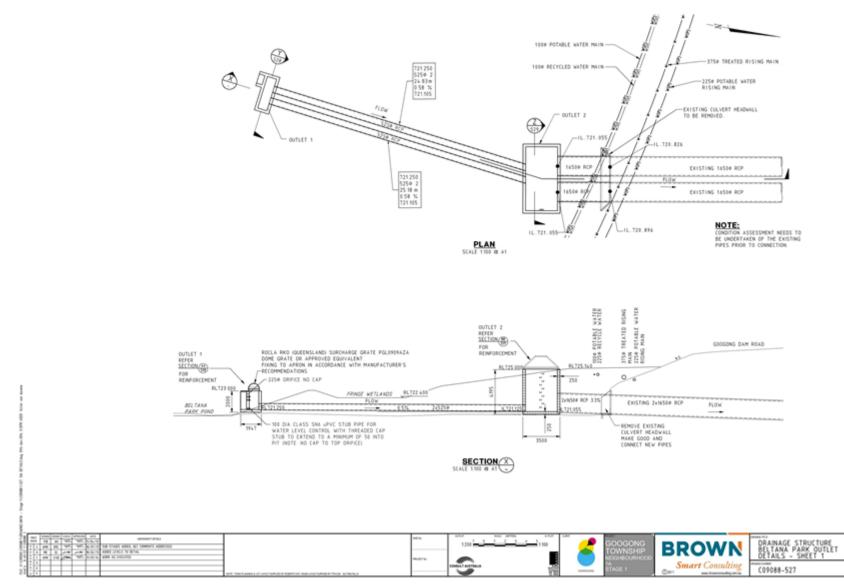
Design drawings - Drainage structure Beltana Park outlet (Sheet 1)
